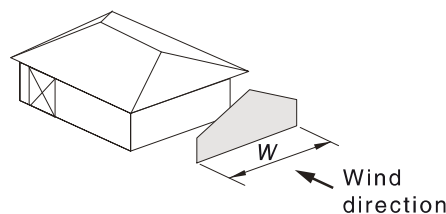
END ELEVATION—SINGLE OR UPPER STOREY—HIP-ENDED ROOF
